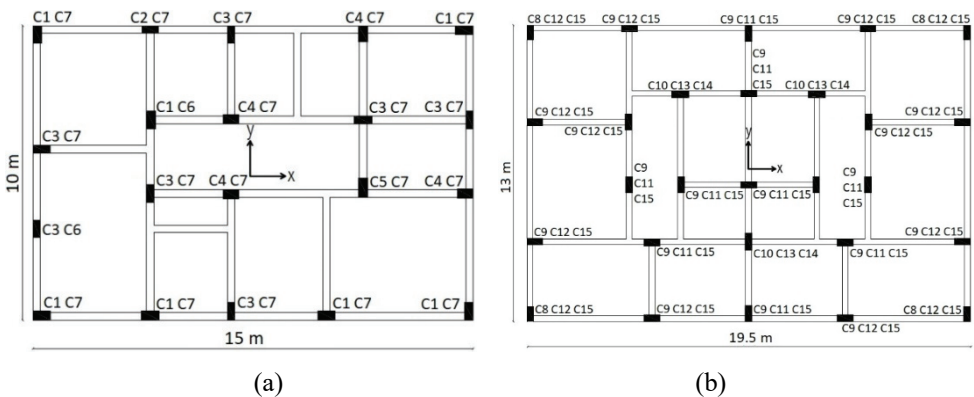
Plan view of ground story for buildings (a) 4-story, (b) 7-story.
